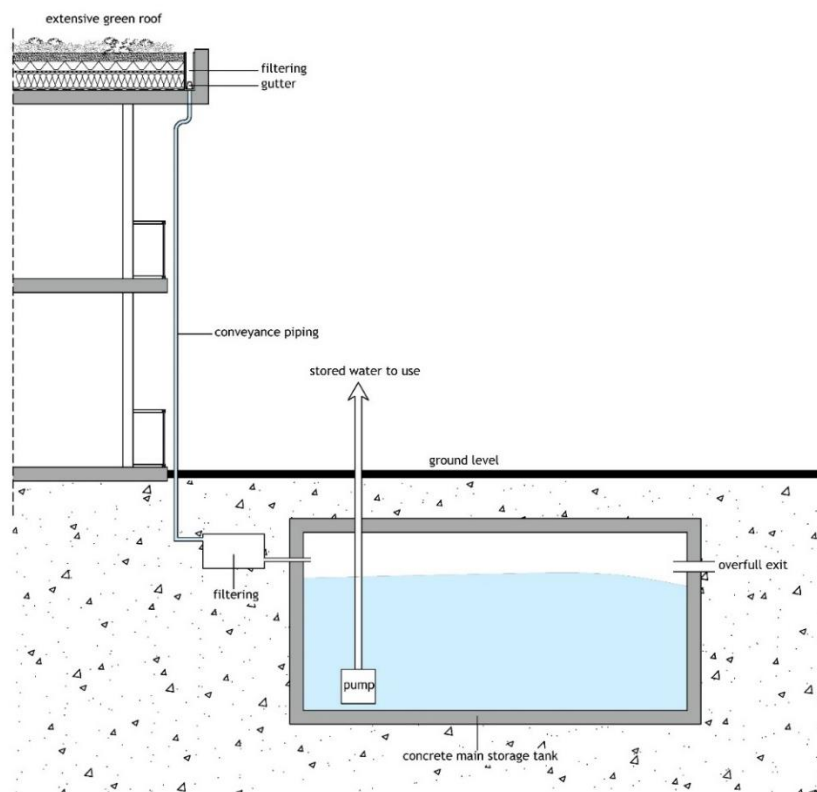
Extensive green roof rainwater collecting system [URL 66]
